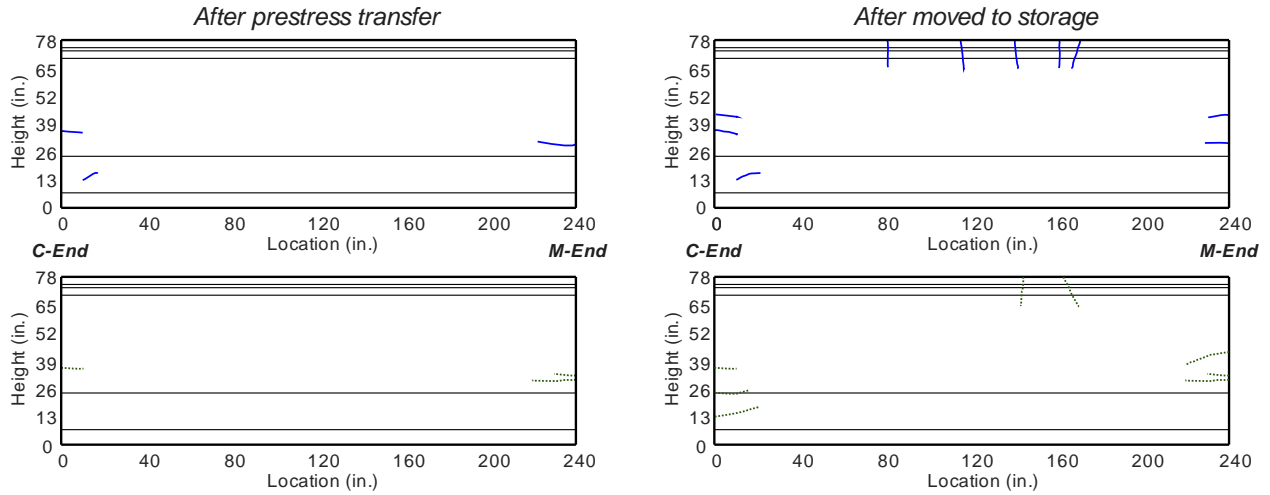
SH-70 before and after transporting to storage crack patterns shown on North face of specimen. Solid blue lines depict cracks visible on the North face and dashed green lines depict cracks visible on the South face.
